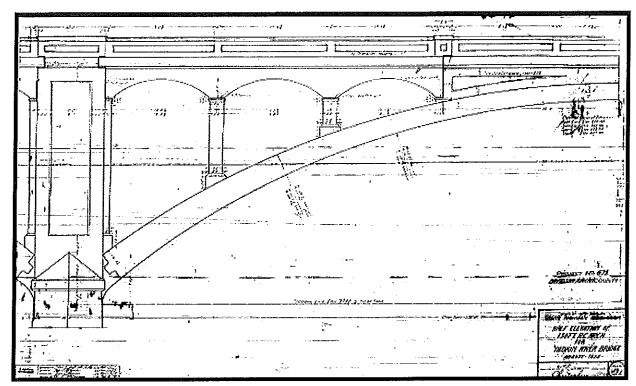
Wilcox Bridge – Plan sheet labeled "Half Elevation of 150 Ft R[einforced] C[oncrete] Arch for Yadkin River Bridge, August 1922" (courtesy NCDOT Bridge Maintenance Division).
